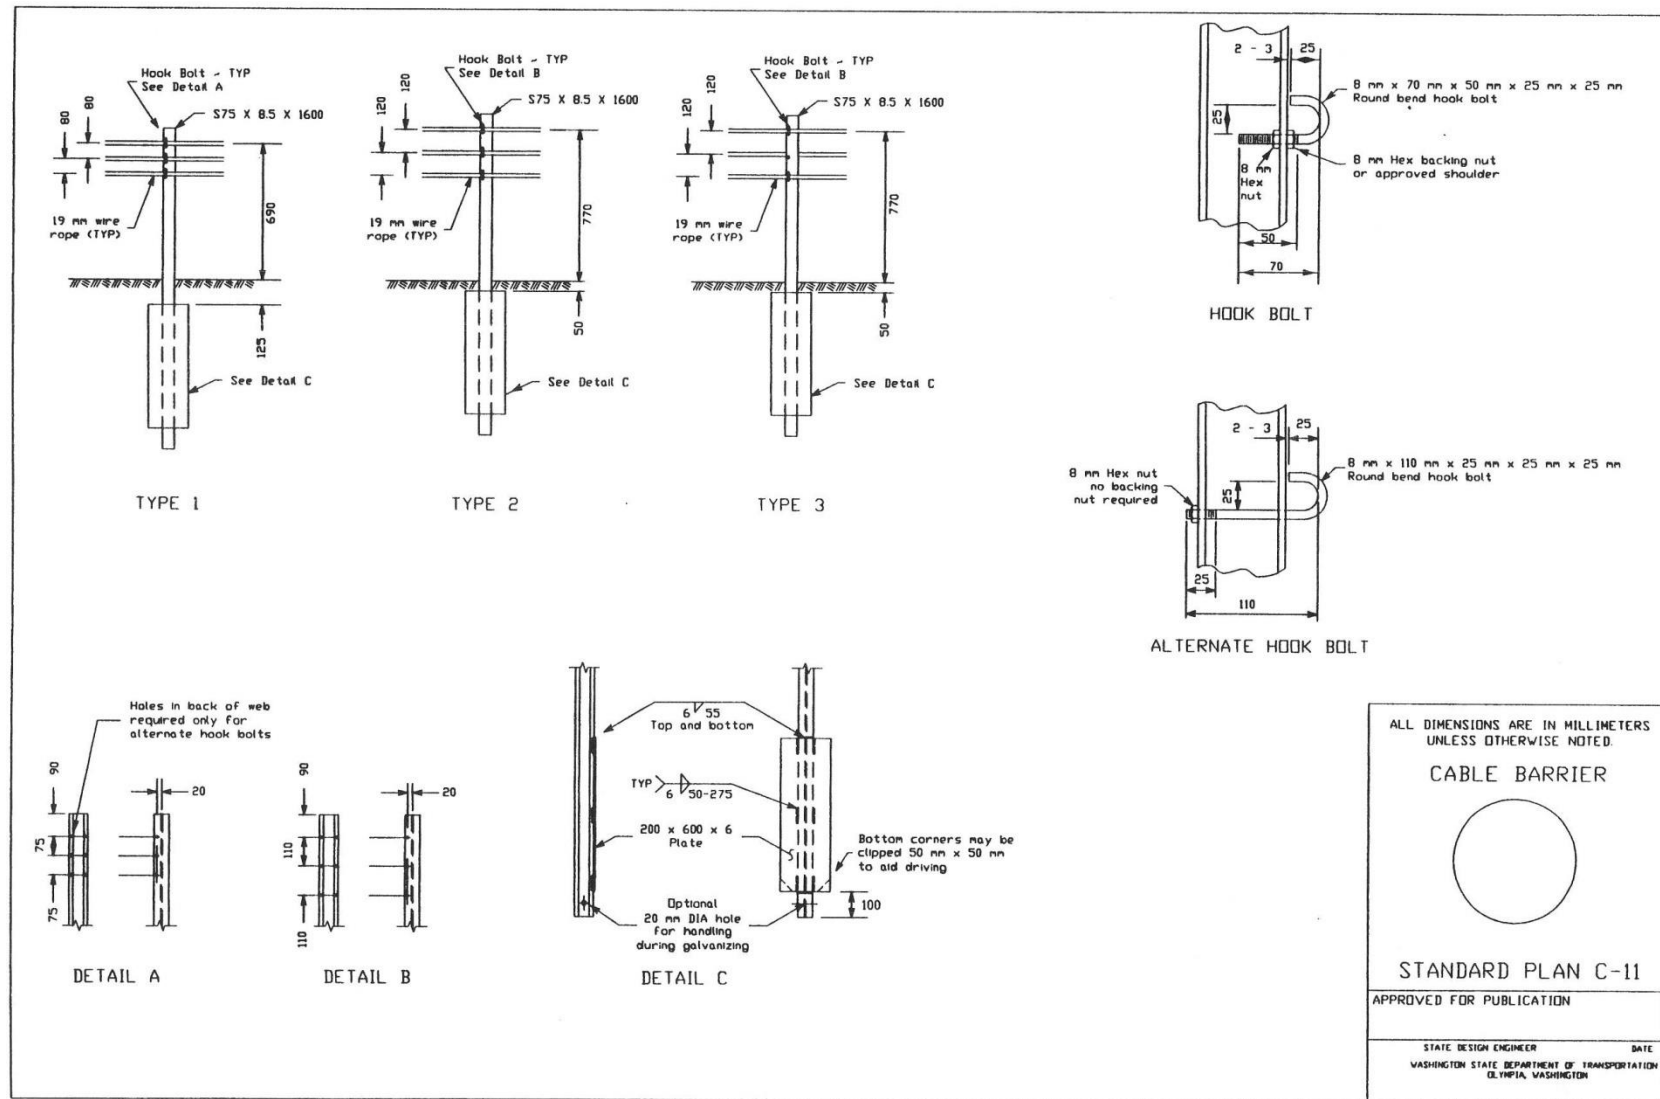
System Details, WSDOT Tested Design, 1996 [53-55]
